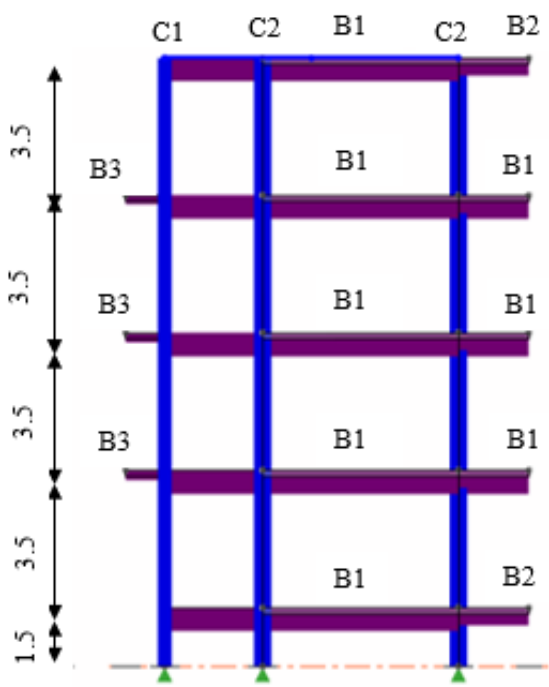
Side view of RC school building frame generated in Tekla structural software
